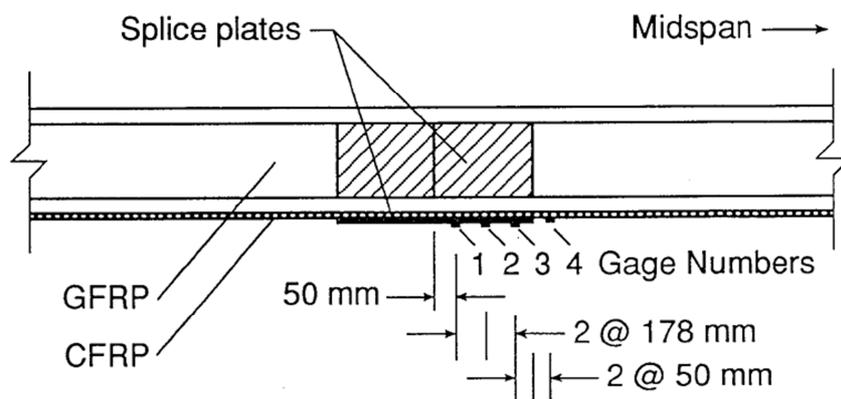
Strain gauge locations on splice plate on girder 2 <sup>[46]</sup>
